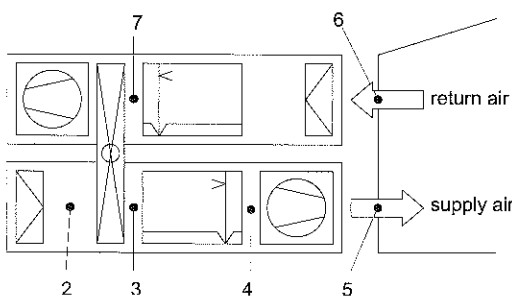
3 Schematic drawing of a combined evaporative cooling process
